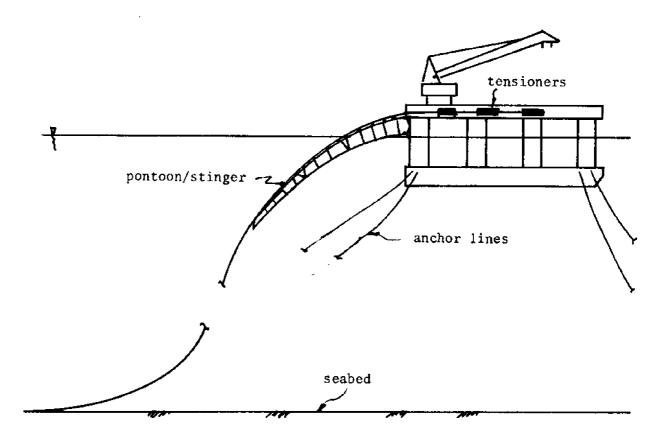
SEMI-SUBMERSIBLE PIPELAY BARGE - STOVEPIPE METHOD
